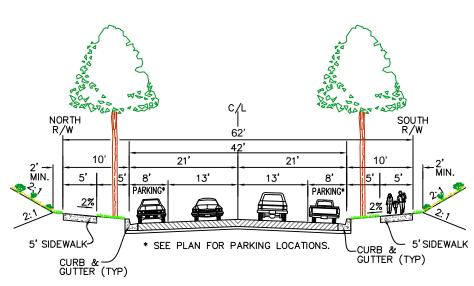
Road Section (Roundabout "A": Lost Canyon Road at Jakes Way)
